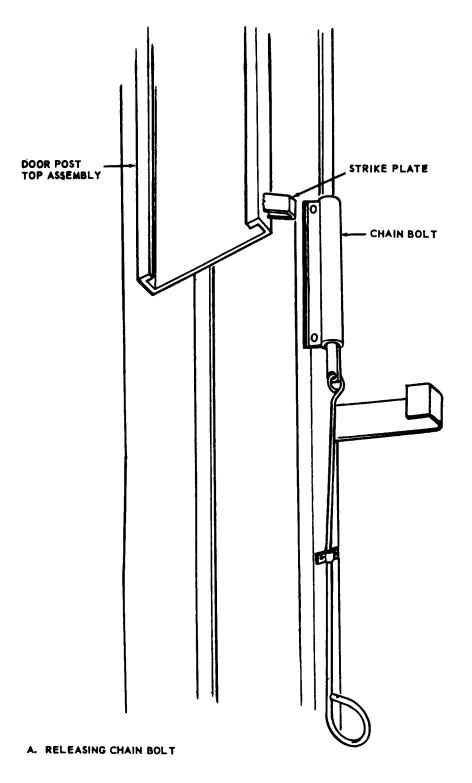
Locking and partially installing door spars (Sheet 1 of 2).
